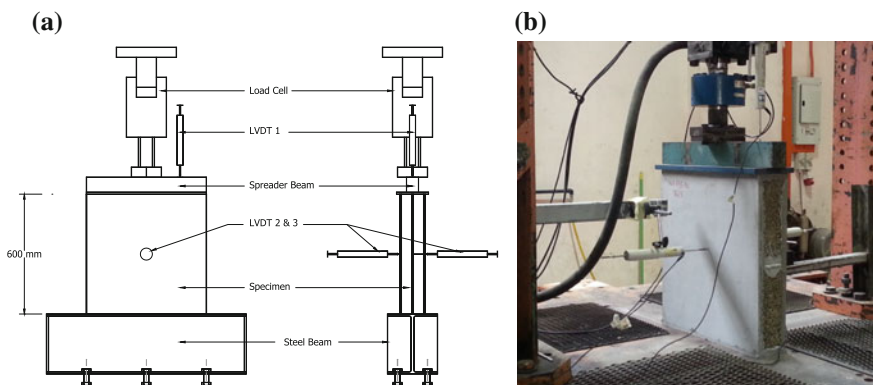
Axial compression load testing set-up of WWCP wallettes. a Illustrated testing set-up. b Actual testing set-up
